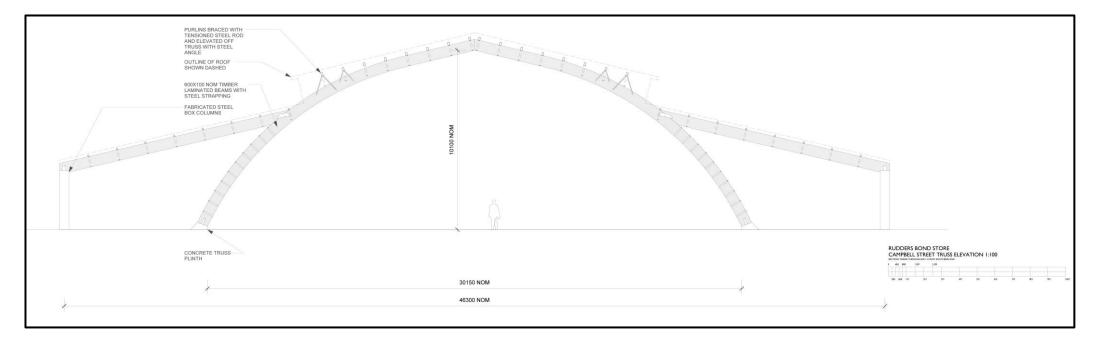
Section plan of laminated timber arch (Source: The Archivist, Drawing No RBS_MD-03, Issue 21.07.16).
